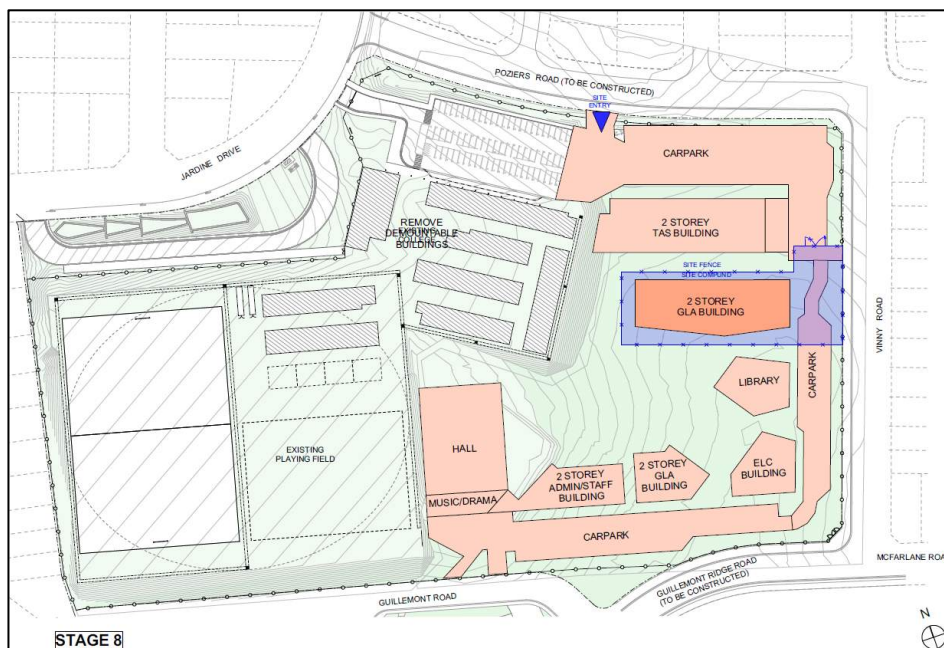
SFCC Masterplan - Stage 8 (Source: JDH Architects)
